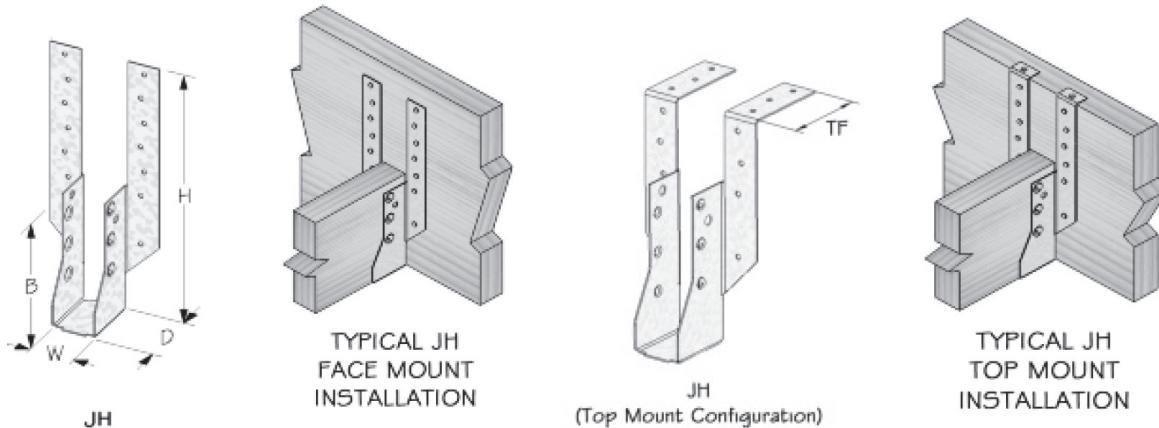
DIMENSIONS AND INSTALLATION OF JH JOIST HANGER
